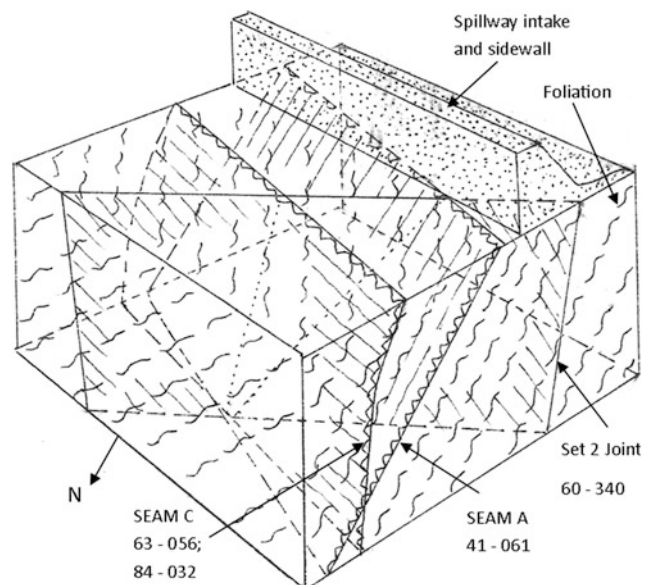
Block diagram of geological structures in relation to spillway wall
